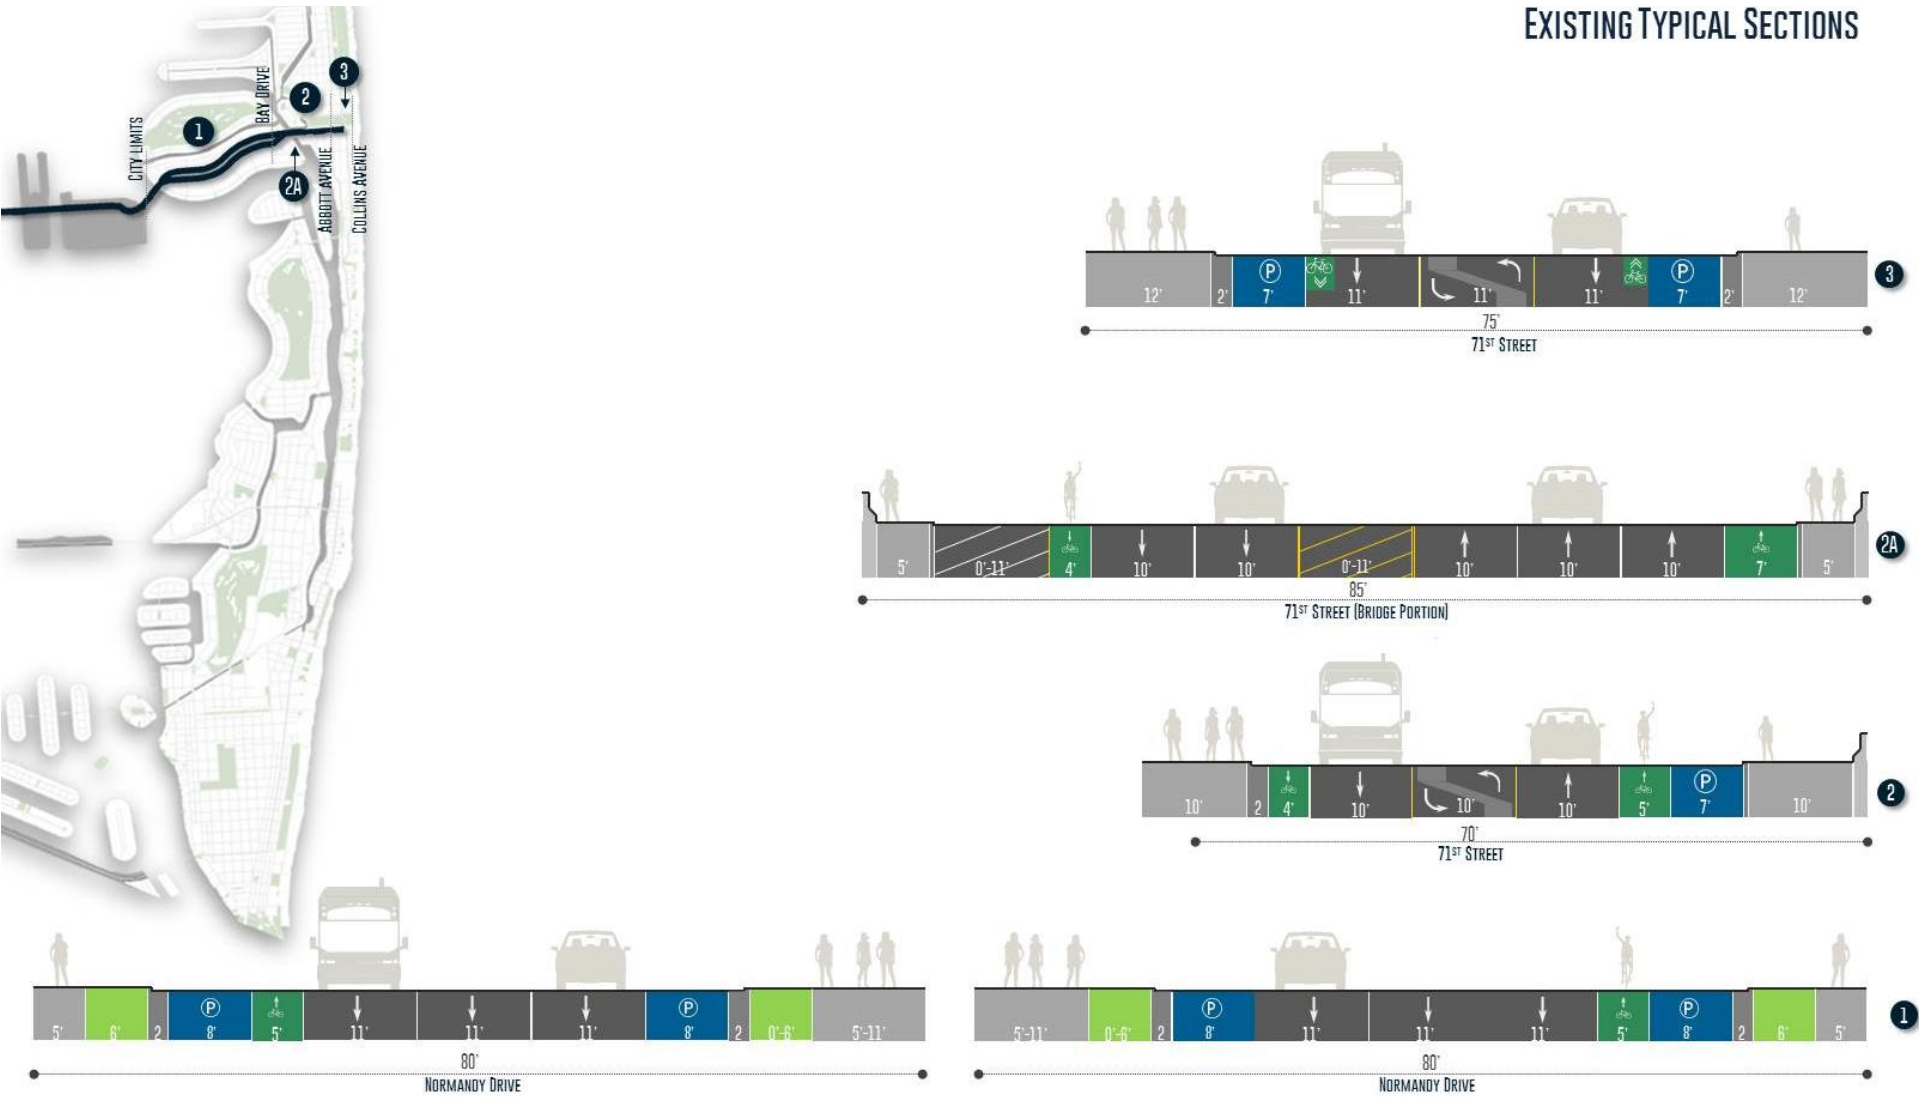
SR 934/79th Street Causeway – 71st Street Corridor Segments and Existing Typical Sections
